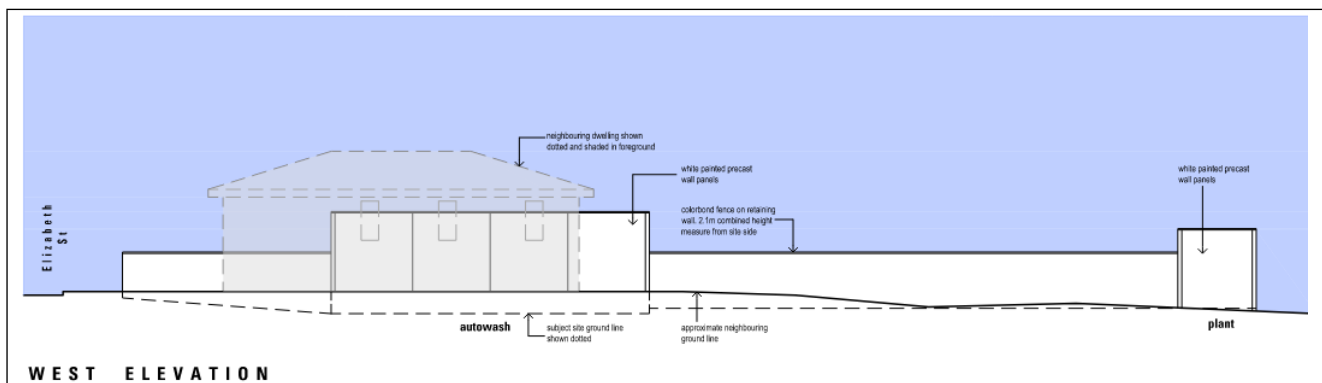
Western elevation of carwash, wall and plant building with adjacent dwelling superimposed (Source: Ratio)
